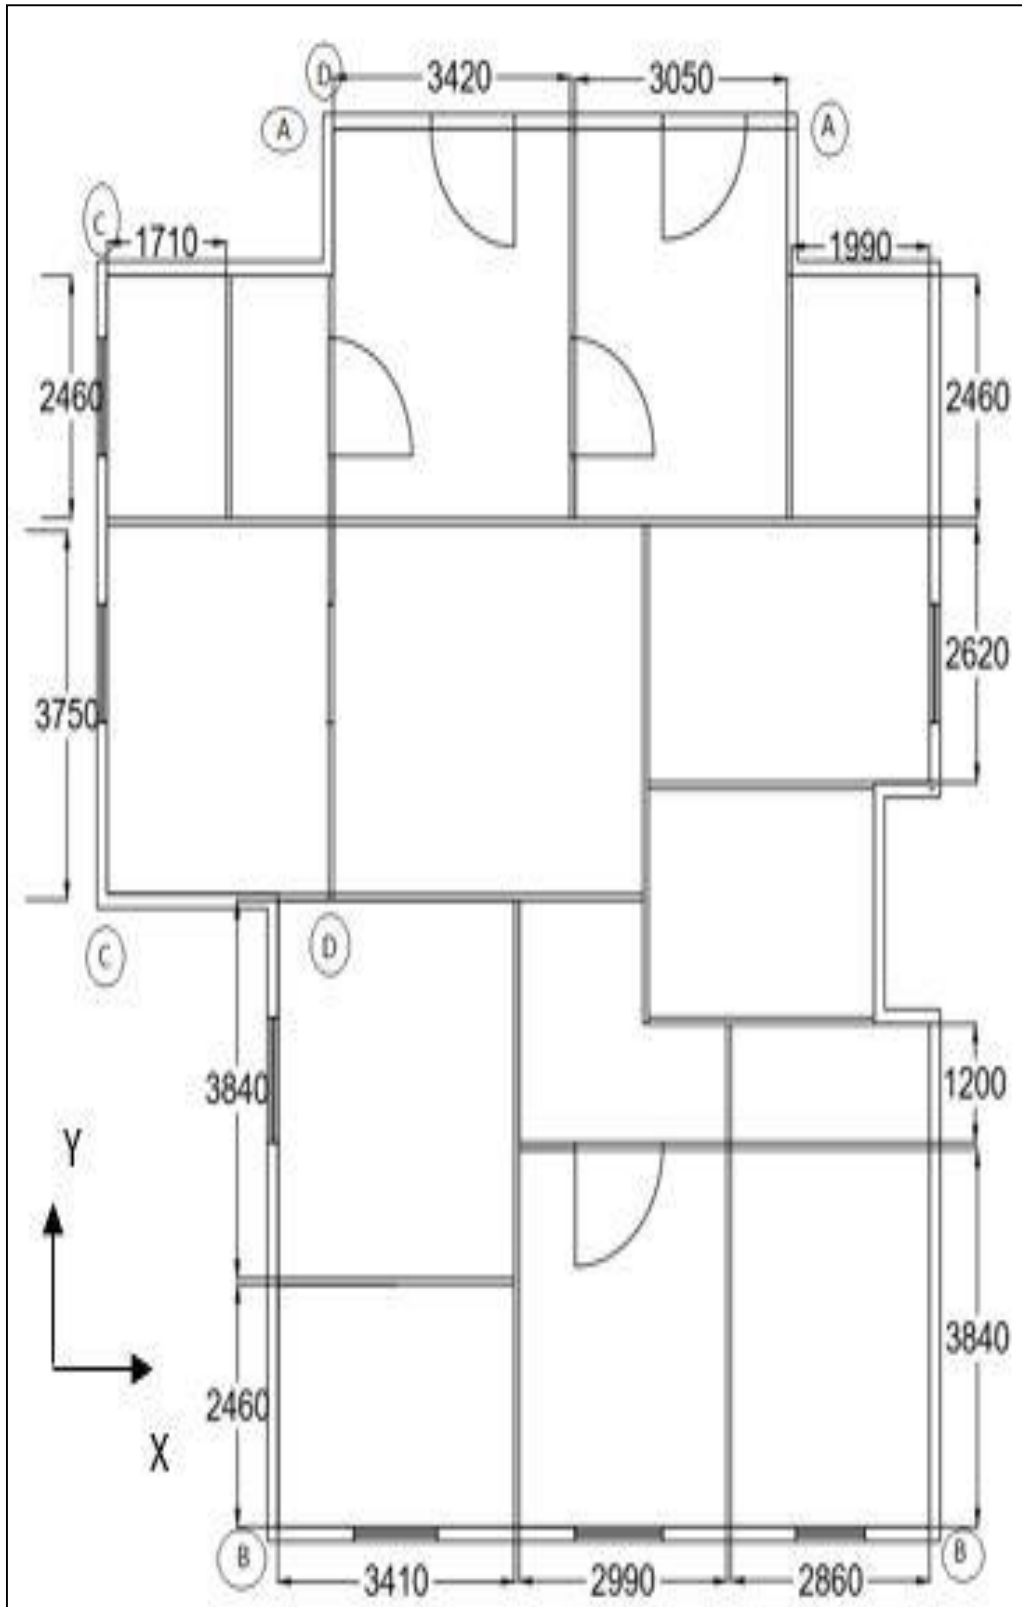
Plan of the building (all dimensions are in millimetres)
